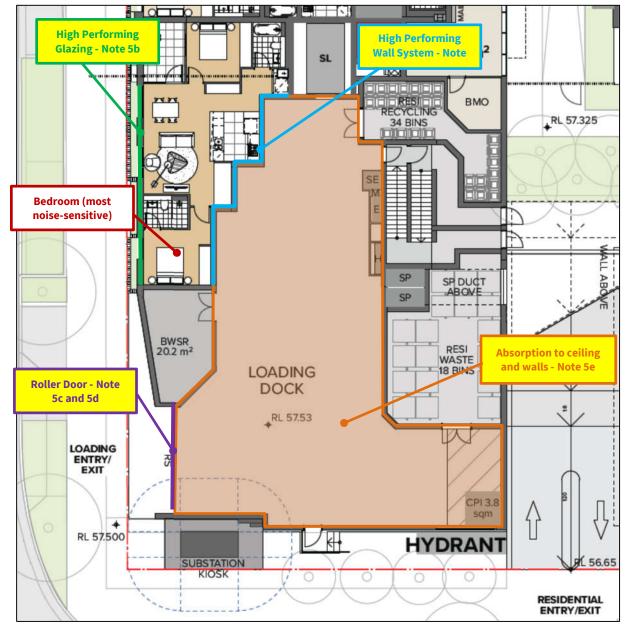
Loading dock was on Level 1 of Building 2A (image source – architectural drawings)
